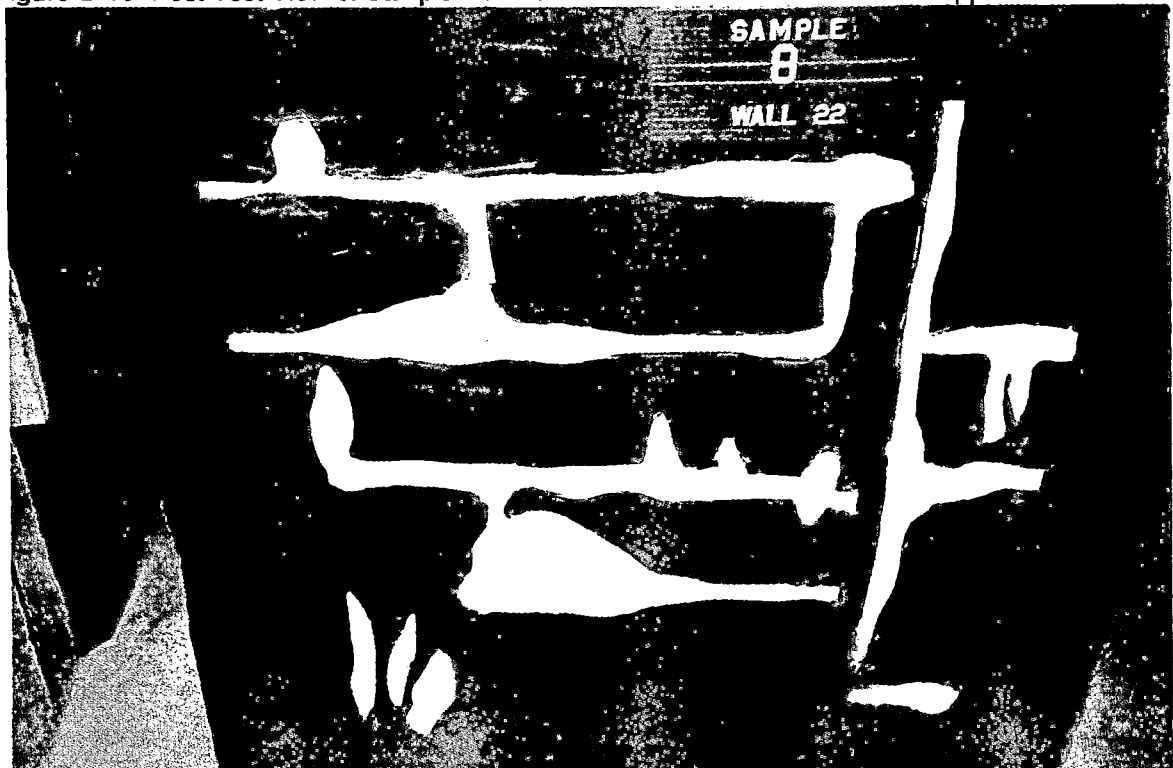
Post Test View of Sample Number 8 on Plain Wall - Adhesive Applied Air Barrier
